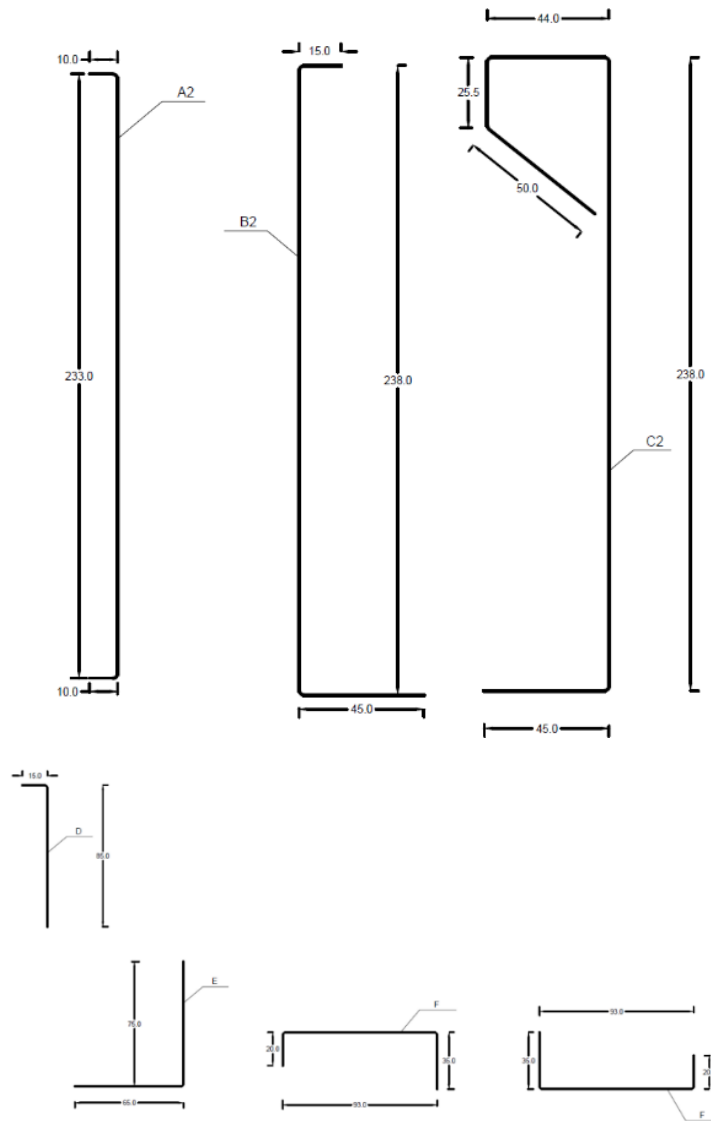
Steel layout in all (2.0m) columns before strengthening
